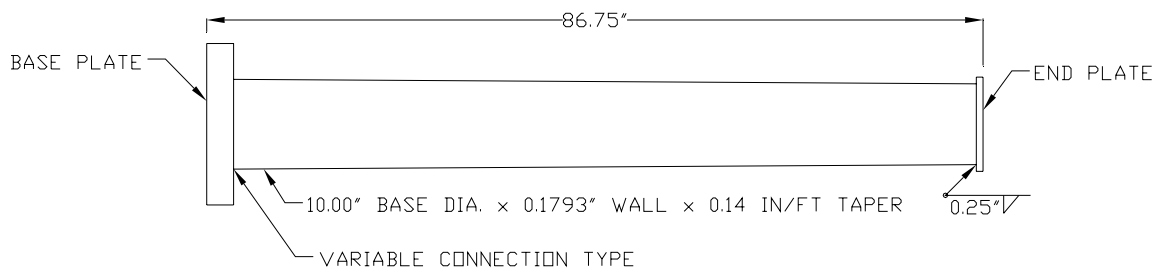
Typical Traffic Signal Mast-Arm Test Specimen
